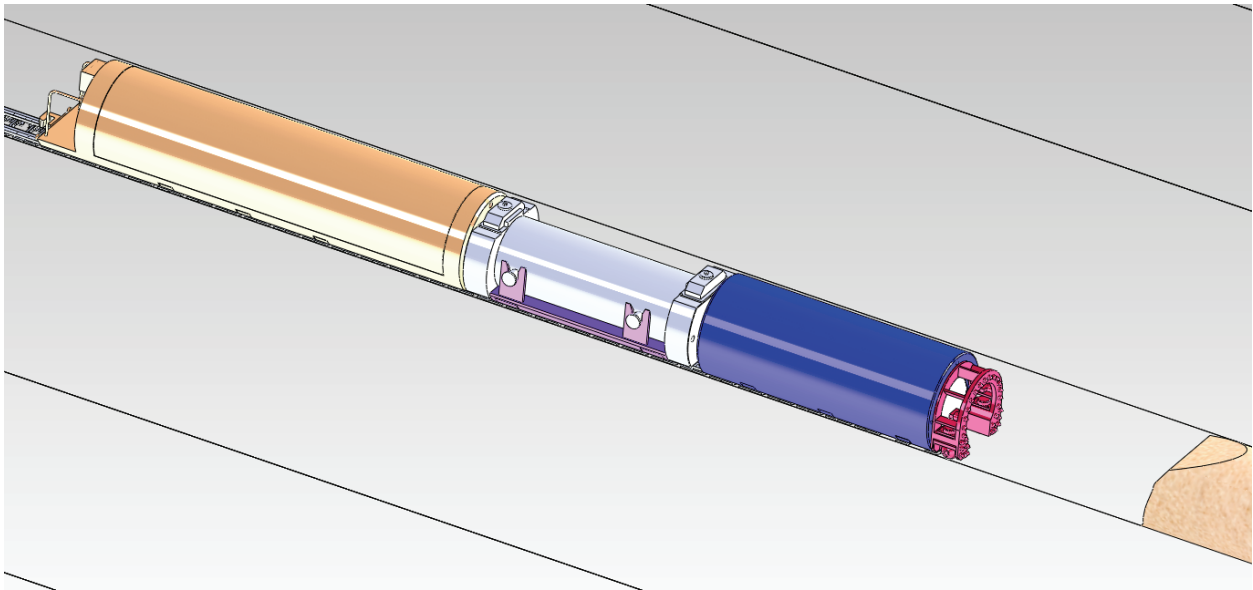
The Power Ram Machine is brought into the tunnel and connected to the Container Transfer Cask. Subsequently, it opens the shielding doors in both the transfer cask and retrieval machine Guide Cylinder.
